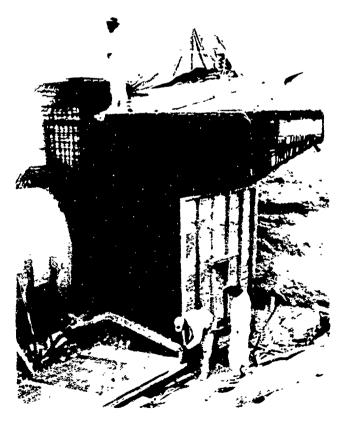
Structure II-2, erecting exterior formwork for shaft T-2 (Aug. 2, 1957).
